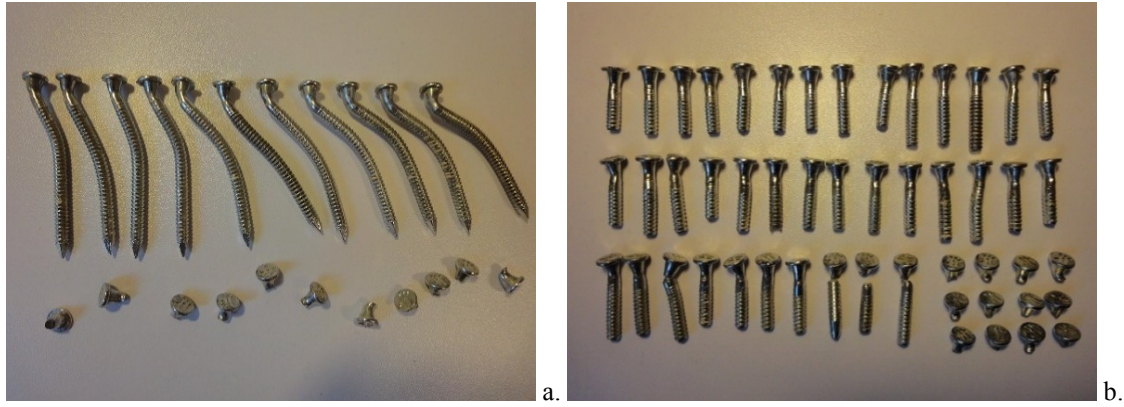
Single fastener joint shear tests: deformed fasteners (a) after monotonic and (b) after cyclic tests.
